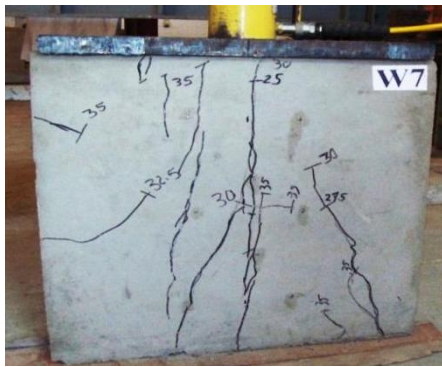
Crack Pattern of W7 with Corresponding Steel Beam
